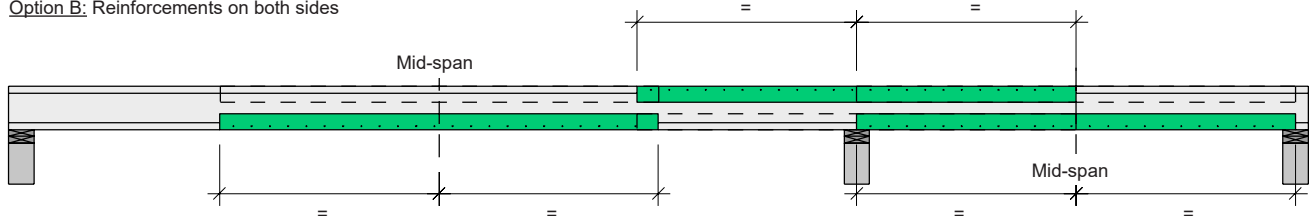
Reinforced NI-20 I-joist in multiple span – See Figure 1 for details
